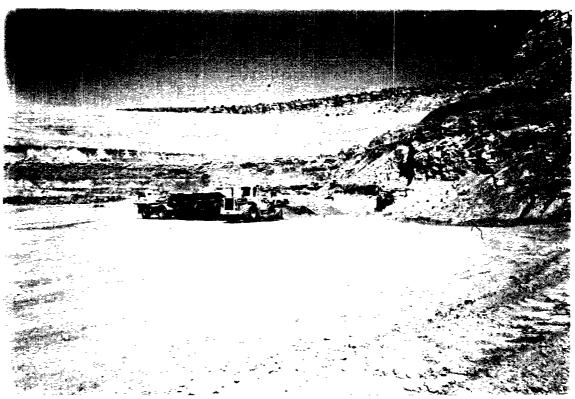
Trucks backfilling JP-OP-41 pond area in Jackpile pit.
